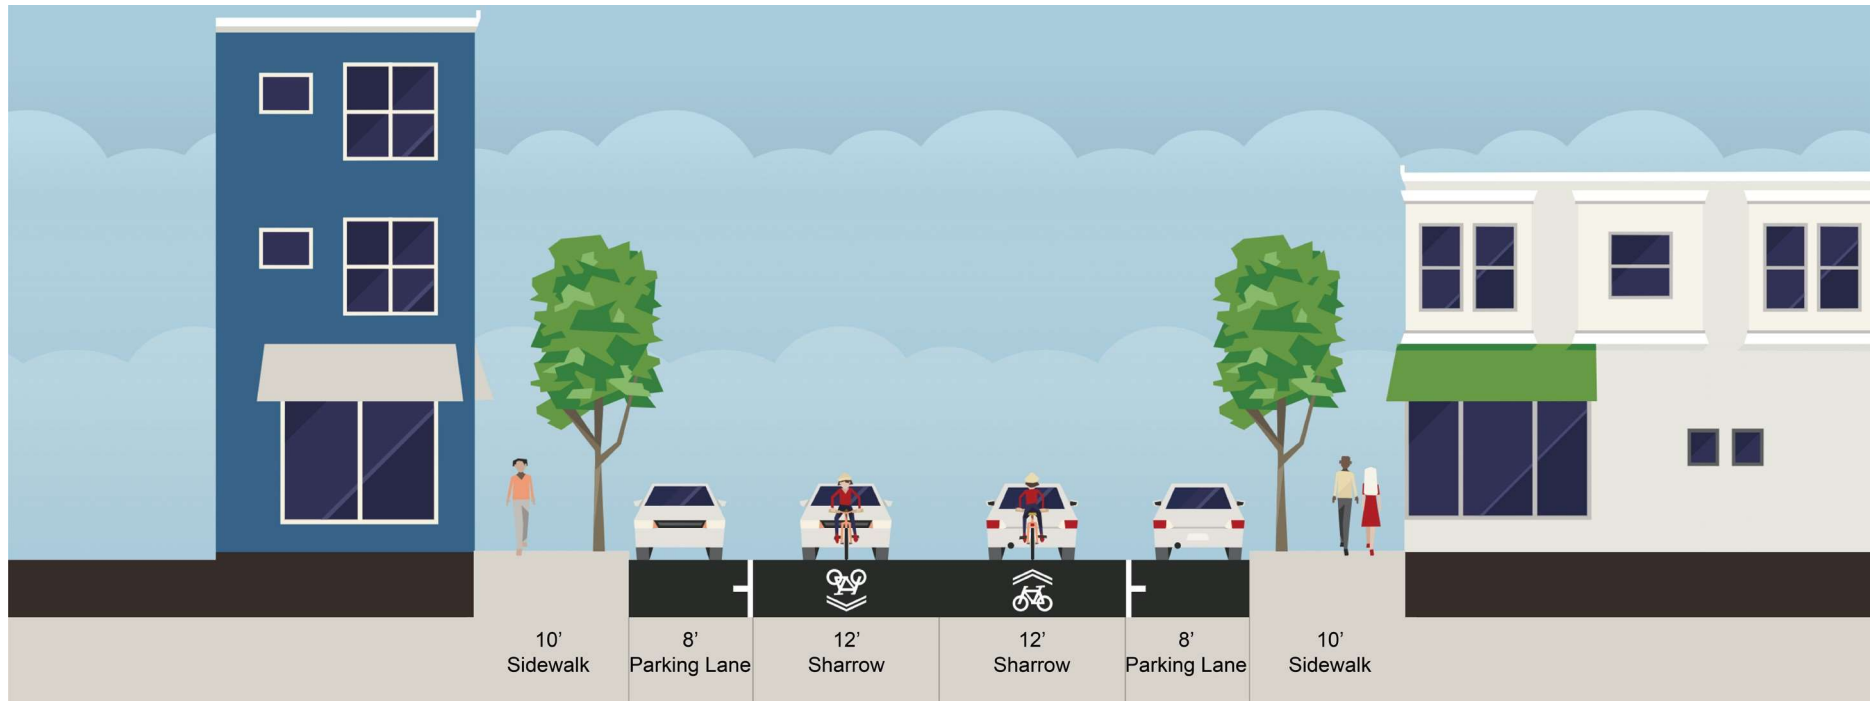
Monte Vista Avenue (1st Street – Bonita Avenue)
